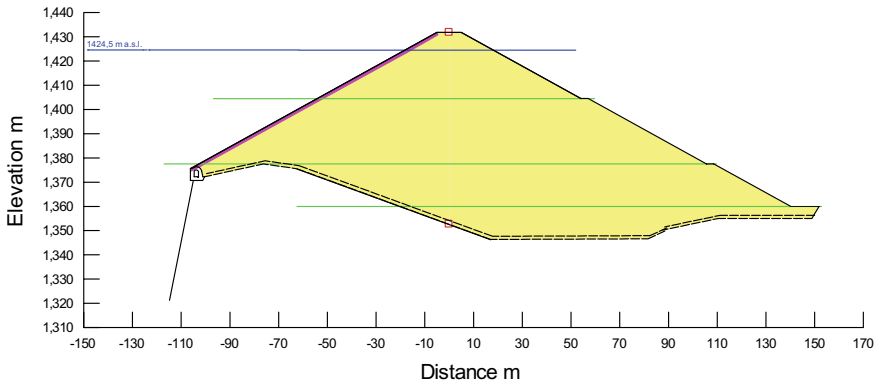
Model for structural analysis, by specified elevations: dam crest at 1,431.75 m asl, normal water elevation at 1,424.5 m asl, first berm on 1,404.5 m asl, second berm on 1,377.5 m asl, upstream toe at 1,375.53 m asl (above grouting gallery), rock at cross section axis 1,352.57 m asl, downstream toe at 1,360.0 m asl. Structural height of 1,431.75–1,352.57 = 79.18 m
